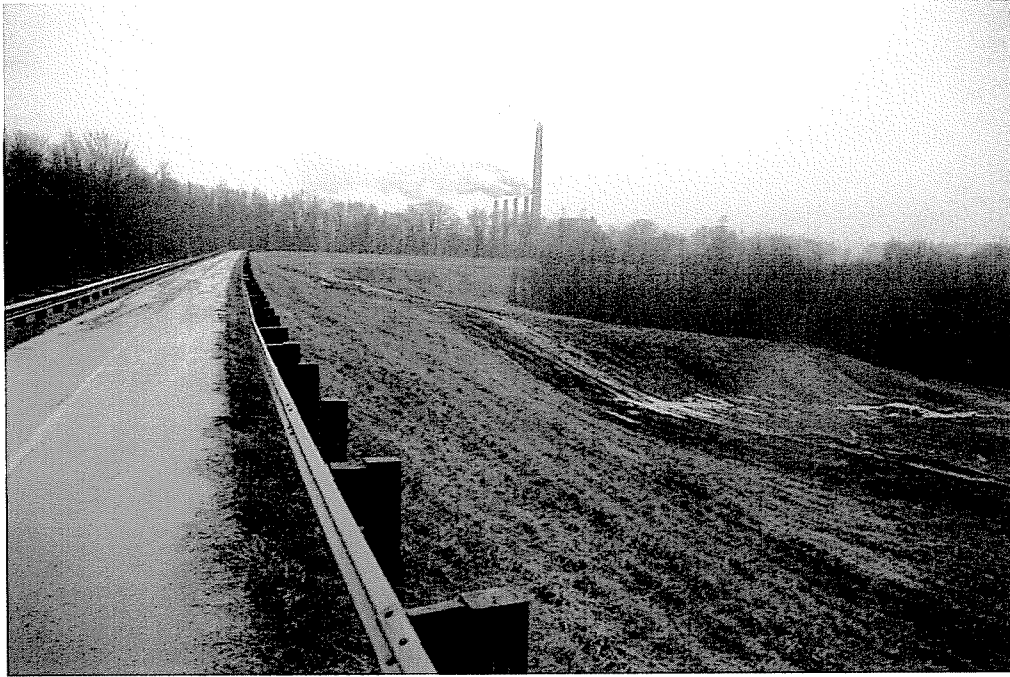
PANORAMA FROM FLOOD WALL LOOKING EAST
